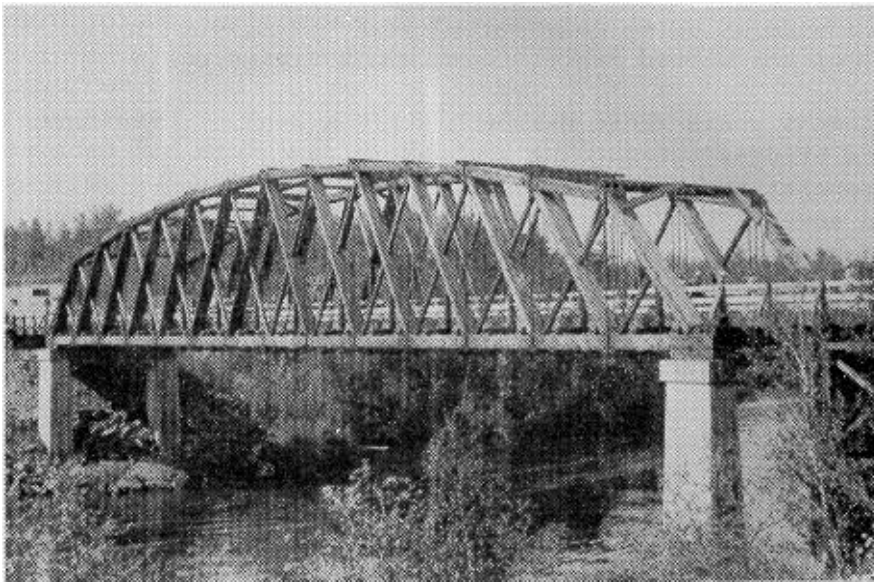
SIOUX NARROWS BRIDGE, KENORA, ONTARIO
